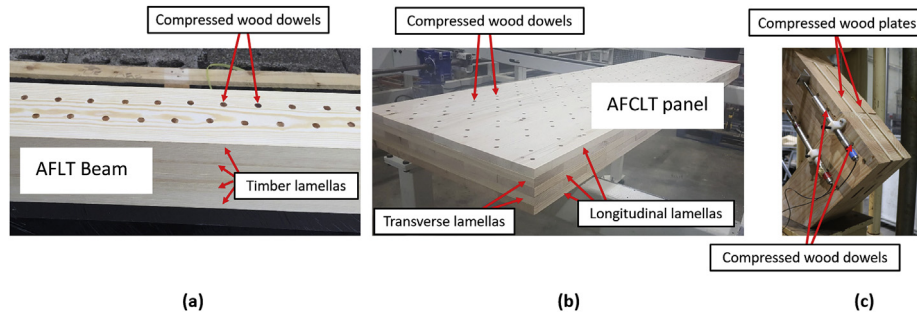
Images of dowel connected structural members: (a) Adhesive free laminated timber beam (b) Adhesive free cross laminated timber panel (c) Timber-to-timber connection.
